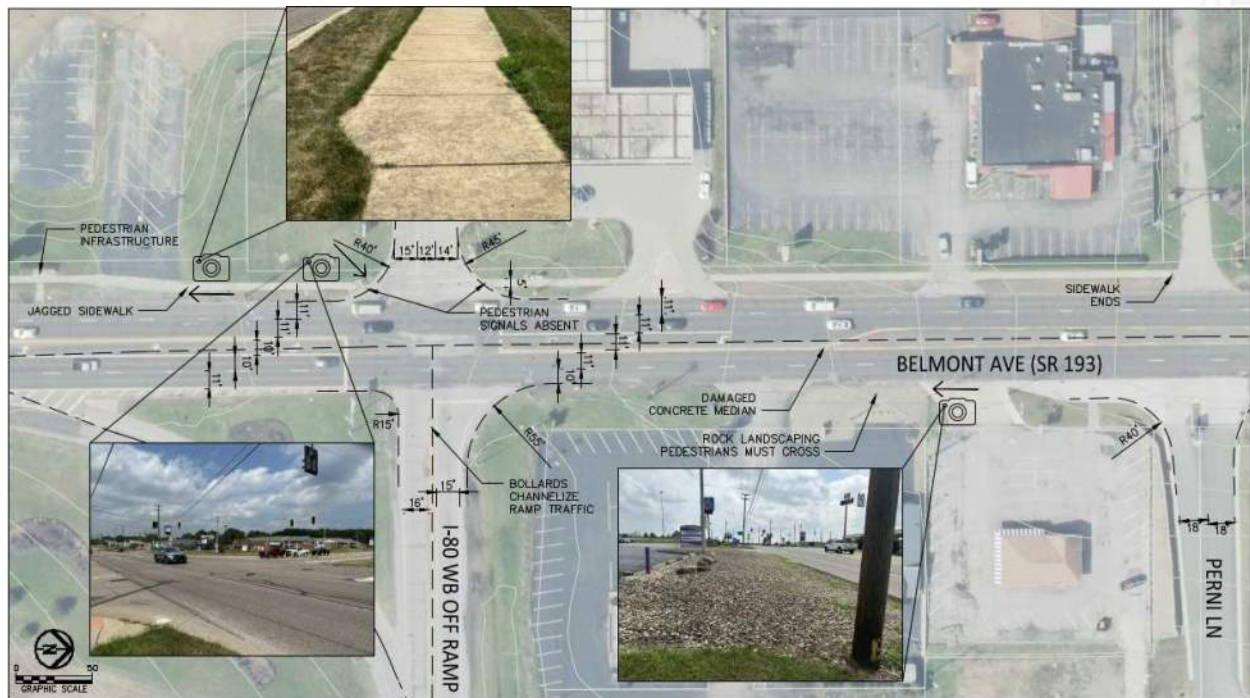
Existing site conditions, from the I-80 westbound entrance ramp to Perni Lane.
